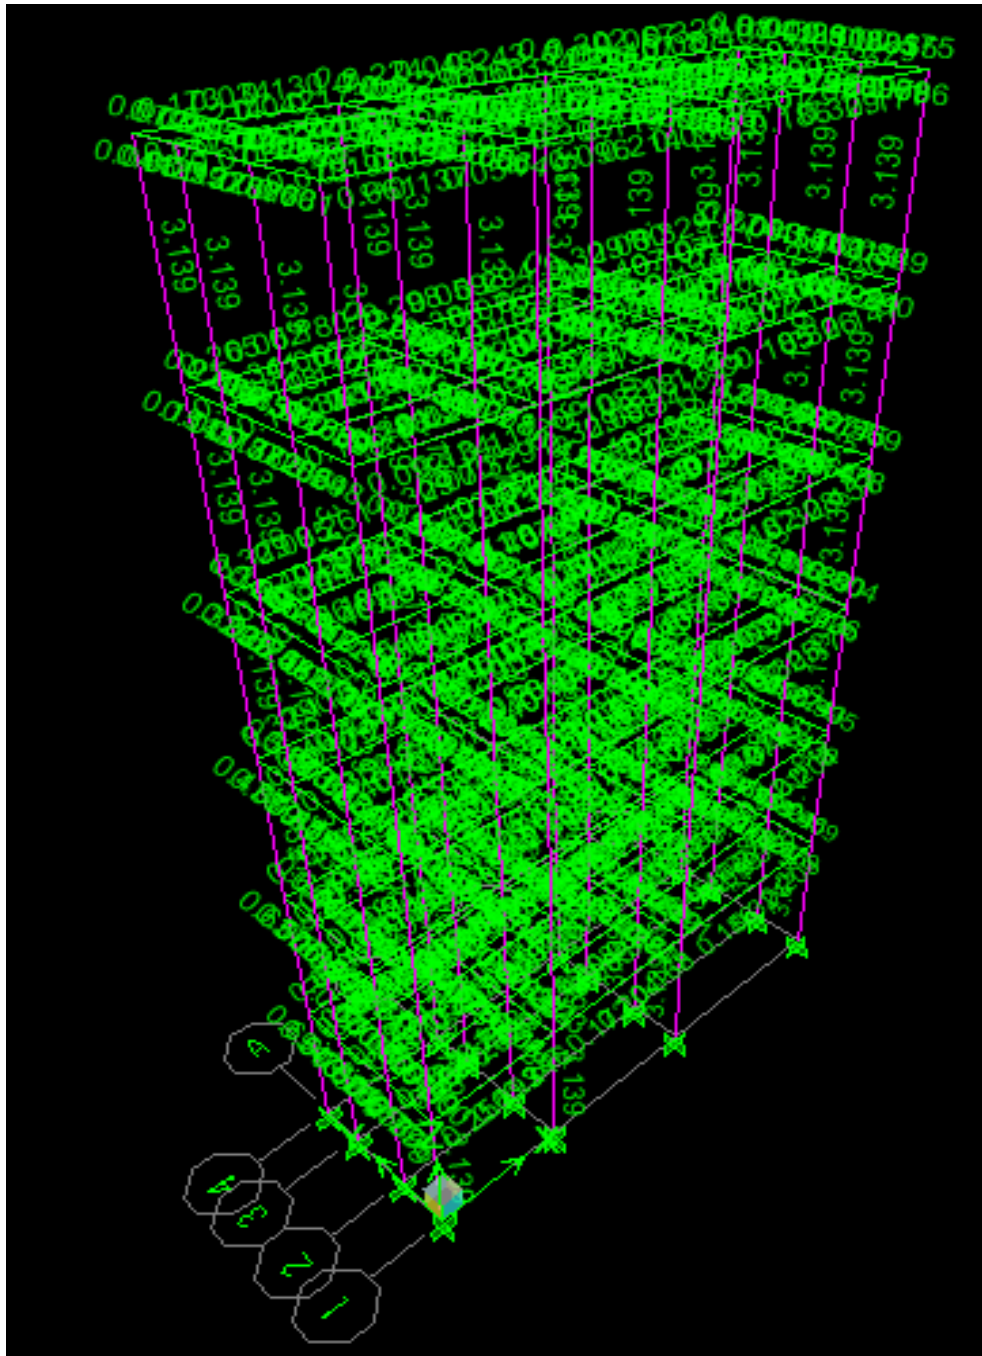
ETABS model of 6 storied building with longitudinal reinforcement
